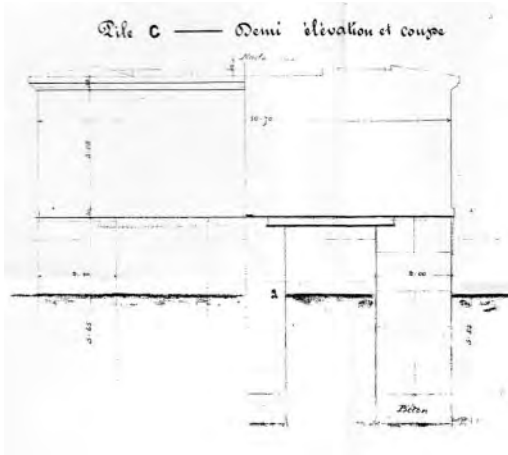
Cruet Bridge: the depth of the cast iron tubes and their concrete filling (Courtesy of ACN&P).
